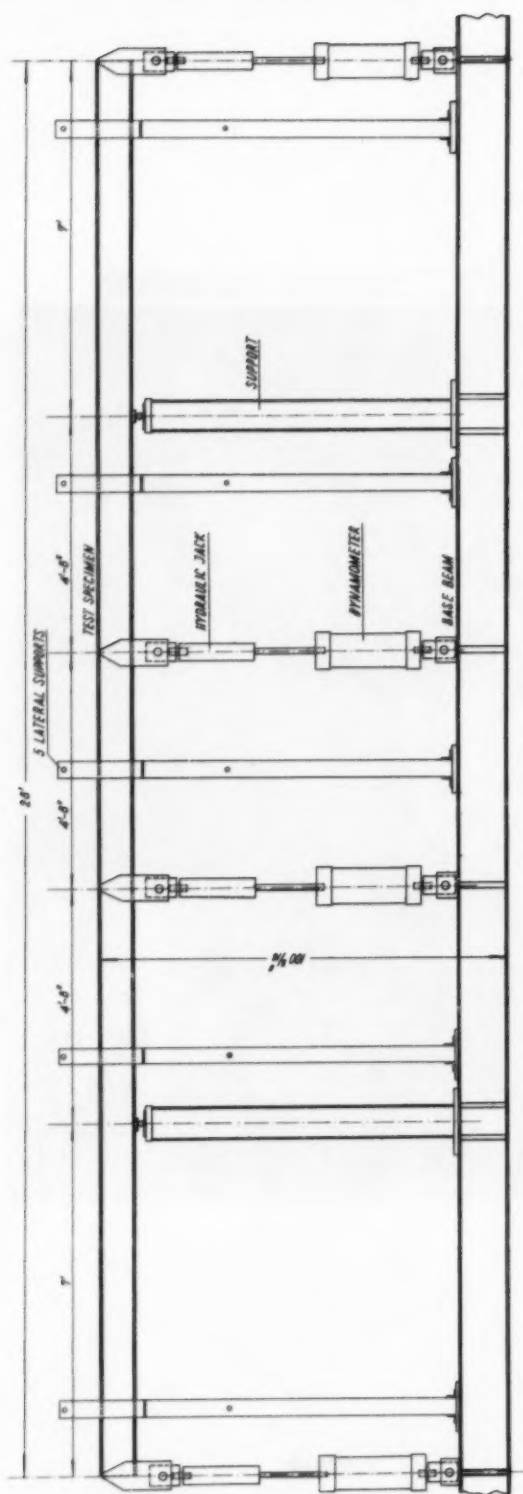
Continuous Beam Test Set Up. Concentrated loads are applied at third points of central span and end loads are used to bring specimen to proper load condition.
